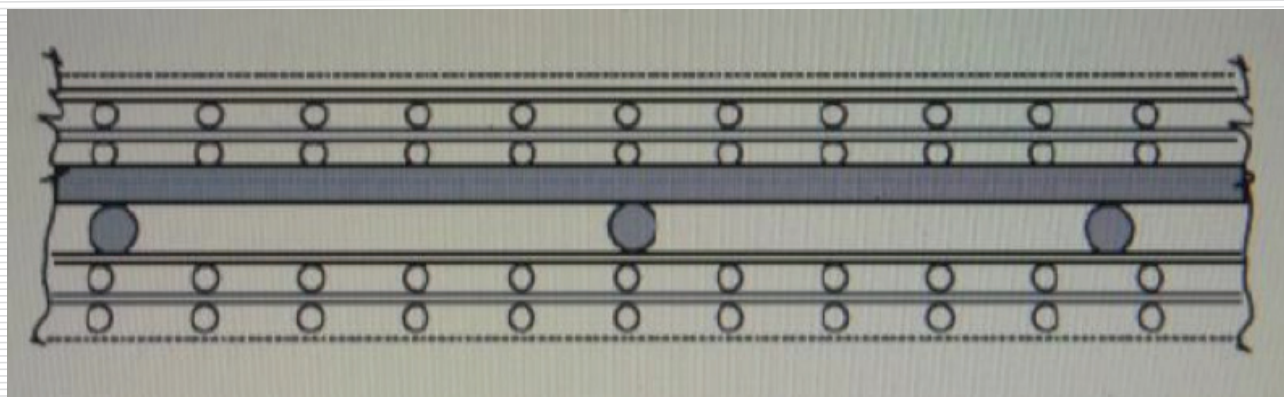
Cross-section of tank wall showing additional layers of mesh reinforcement for large capacity ferro-cement tanks..
